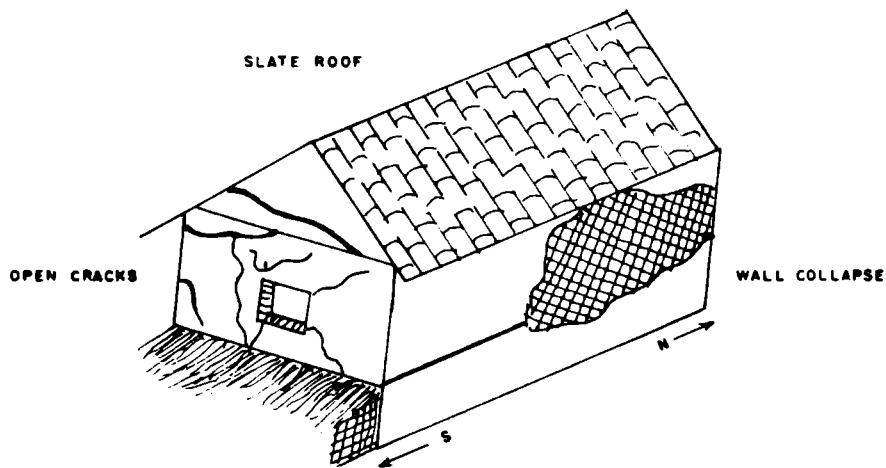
DAMAGE OF N-S ALIGNED KUTCHHA HOUSE - AGONDA
